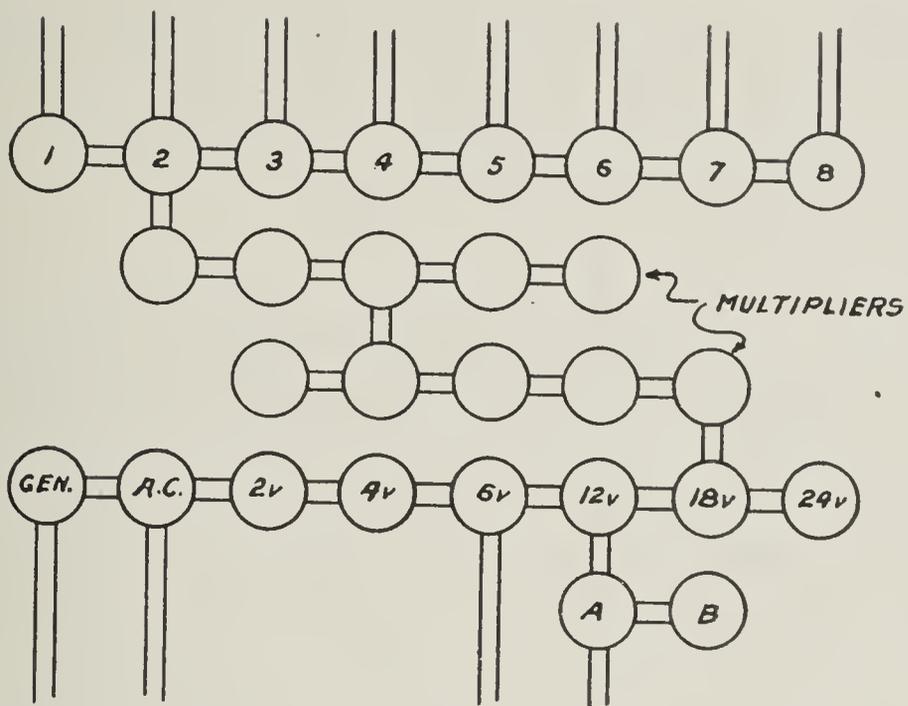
ARRANGEMENT OF OUTLETS AND CONDUITS. NO WIRING SHOWN.
